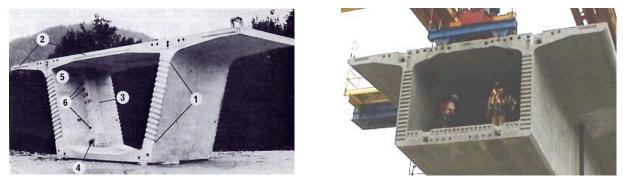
Precast segmental box girder sections. Left: pre-1975 (PTI 1978). Right: 2000
